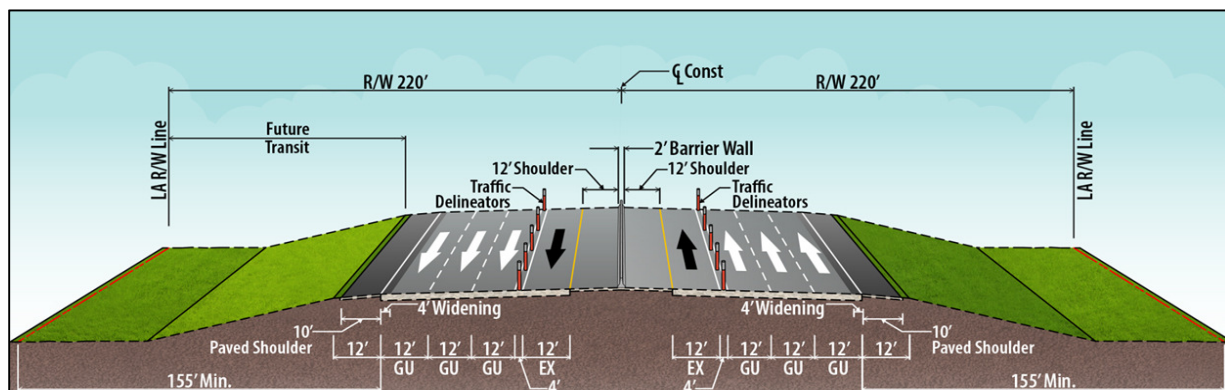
I-275 Mainline Starter Project Build Alternative Typical Section from south of 9th Street North to north of 4th Street North (Segment C-SP3)
